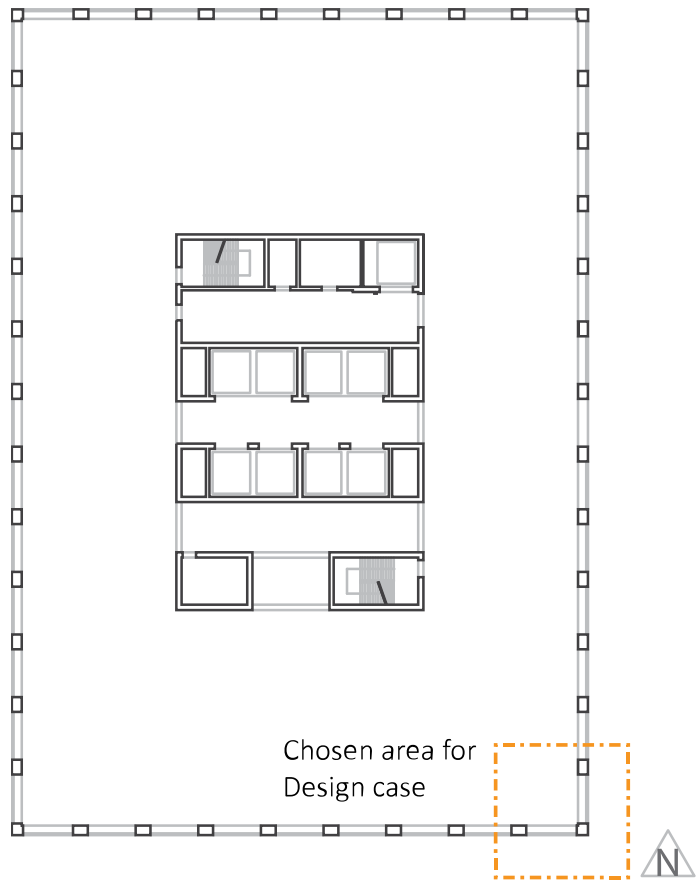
Typical floor plan the building that needs to be refurbished into a housing, Source: Own illustration
